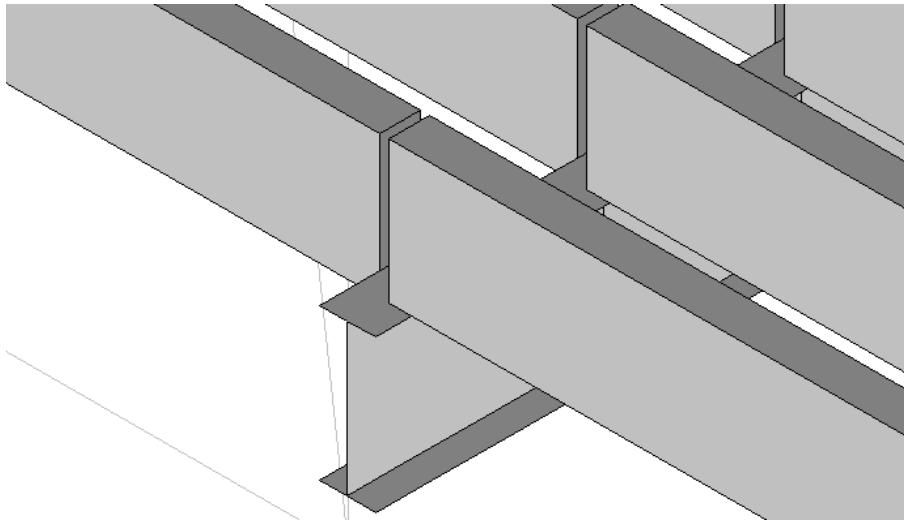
Fruita Bridge: Rendering of timber stringers on a steel floor beam. The rendering was produced by RISA 3D.
